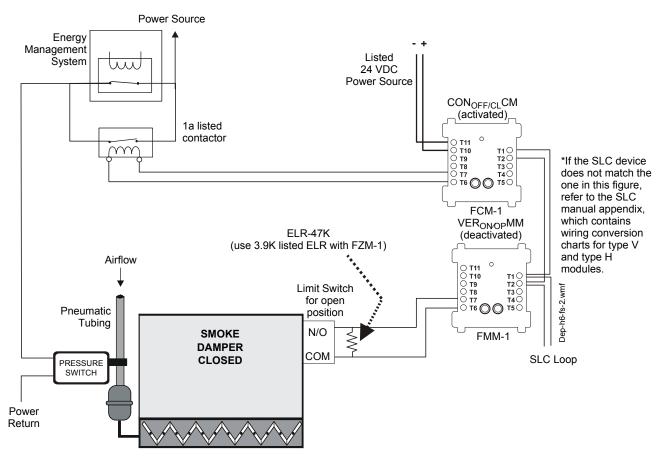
EP Damper Control - HVAC Switch Group Type 6
